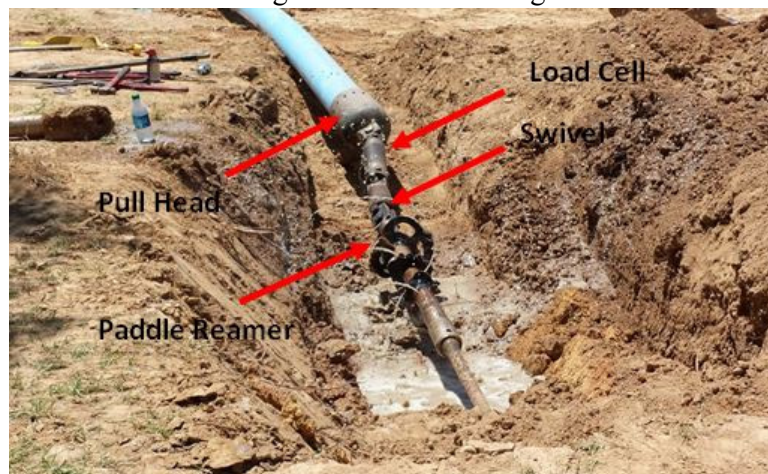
Reamer, Load Cell, and Pull Head Assembly.
